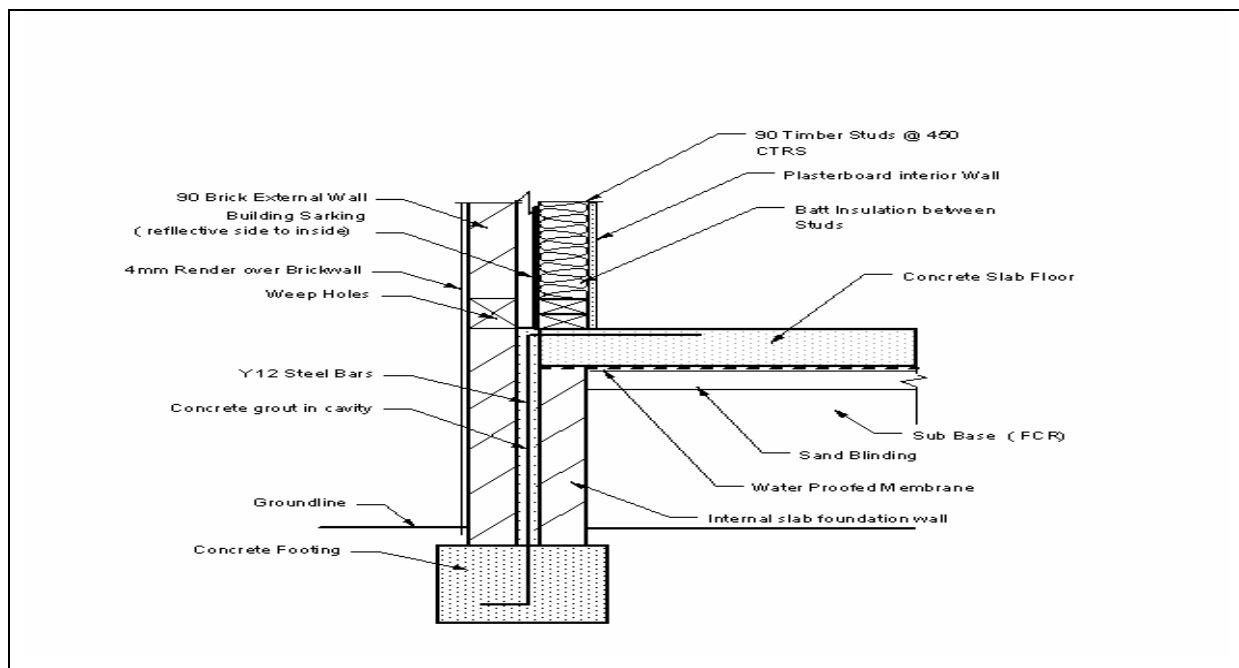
Construction detail of the slab floor test house depicting the perimeter wall detail
